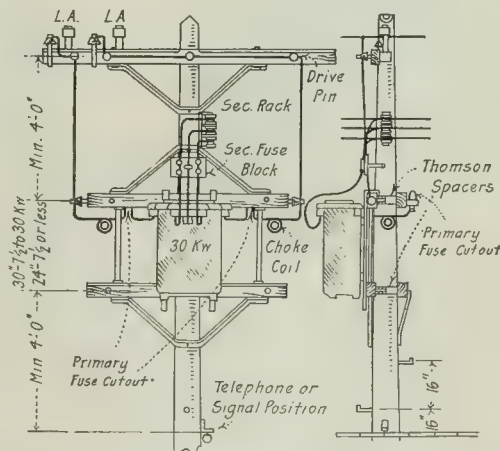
METHOD OF INSTALLING FUSE BLOCKS ON TRANSFORMER POLES
